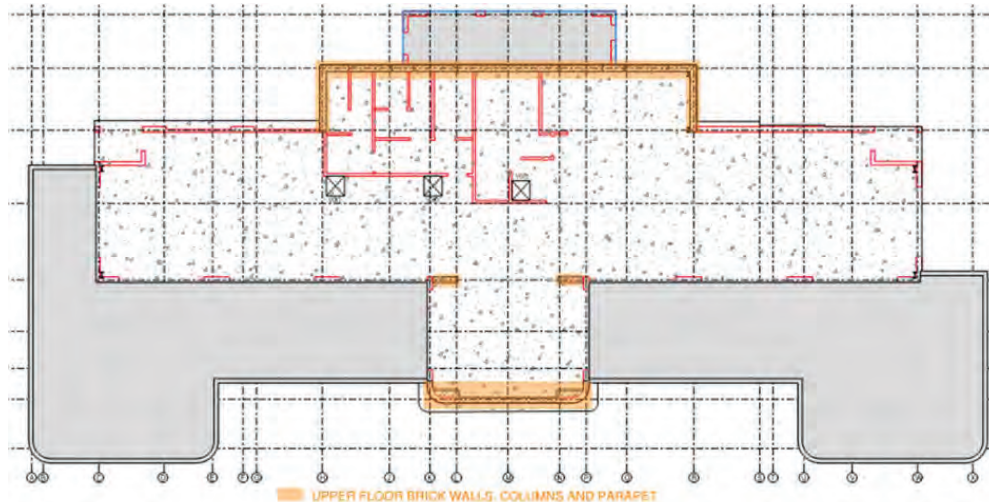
Upper floor brick walls, columns and parapet/dwarf wall
